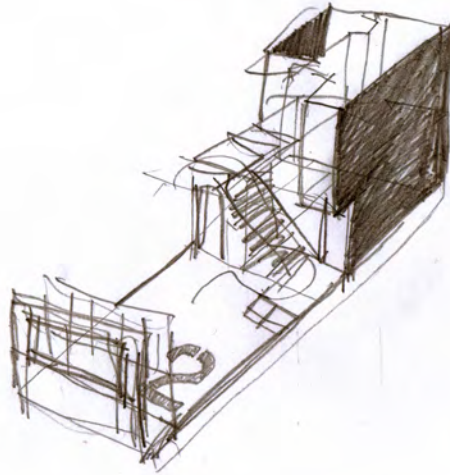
Exploratory sketch of Type 2 Duplex showing room layout
